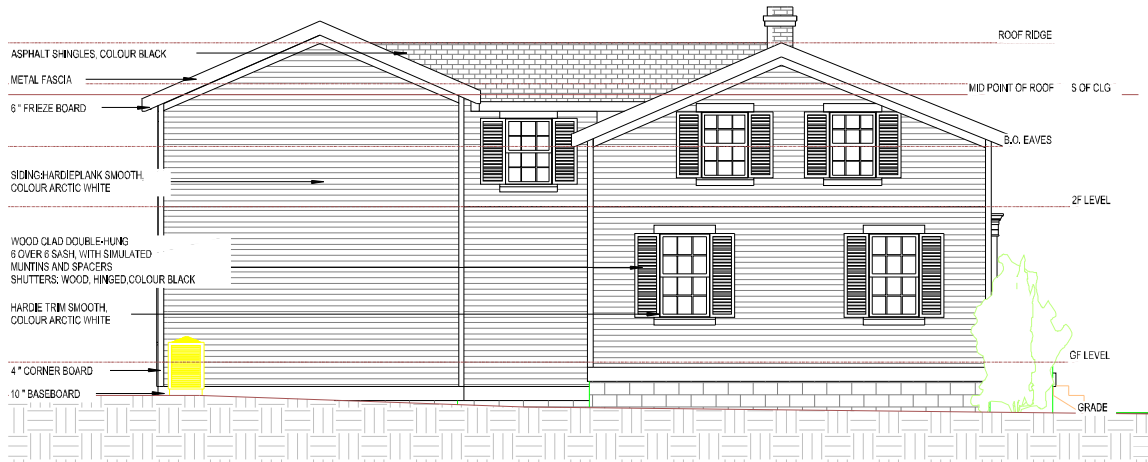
Proposed east elevation for No. 89 Nashville Road.
